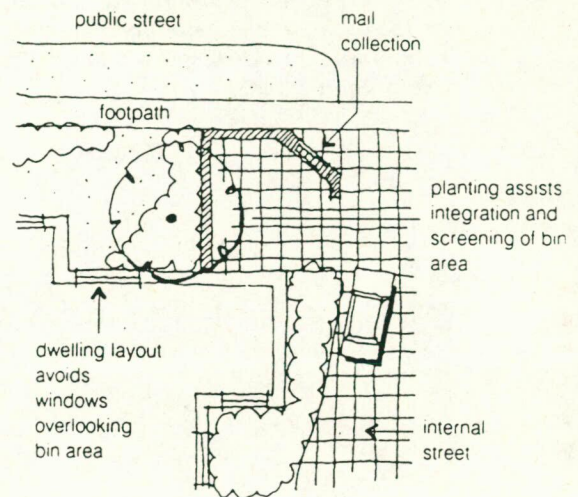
MAIL AND GARBAGE COLLECTION AREAS, WHERE PROVIDED, TO BE INTEGRATED WITH BUILDING DESIGN AND LANDSCAPE
